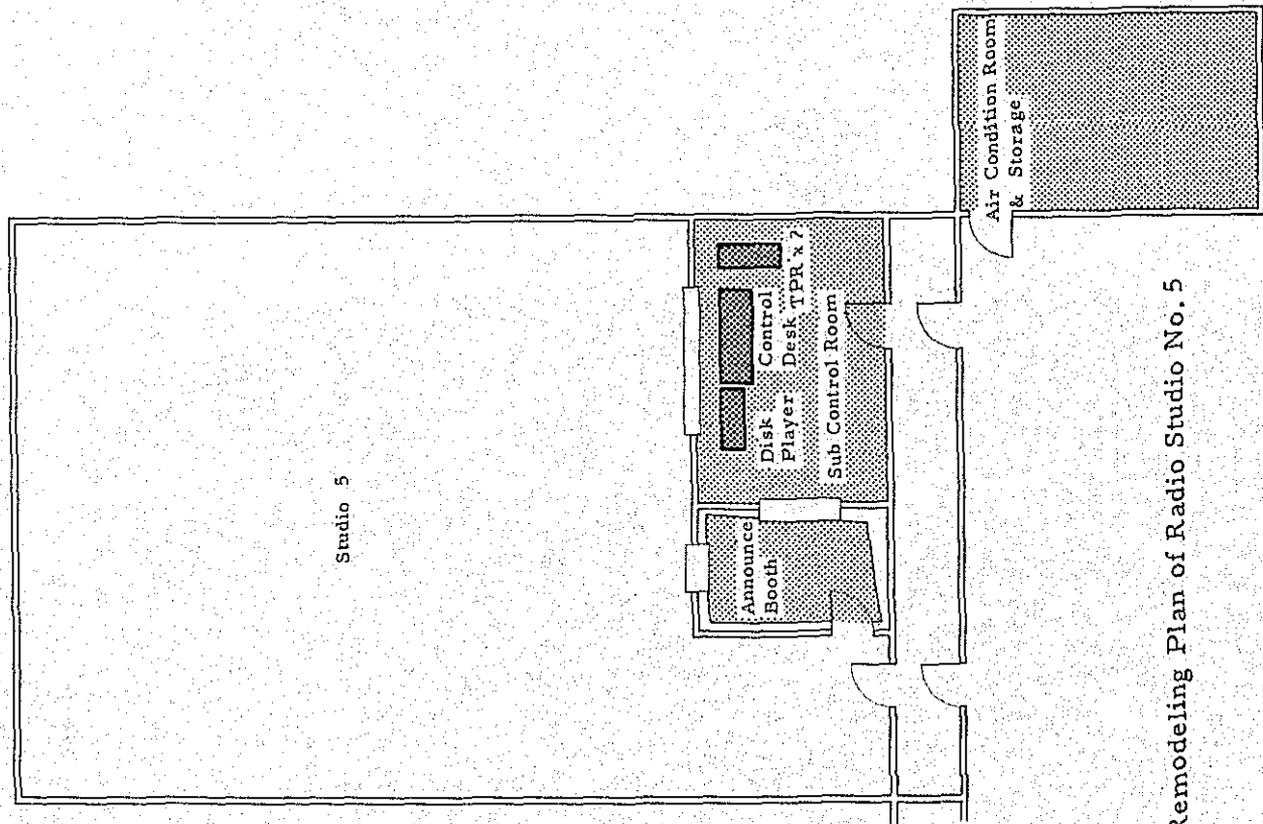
Remodeling Plan of Radio Studio No. 5
